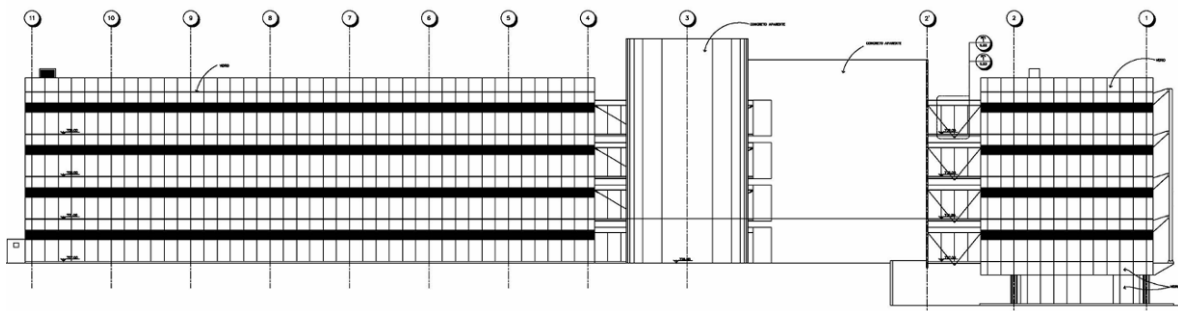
Elevation of North Façades, with Horizontal Brise-Soleil (black stripes) and Vertical-Brise Soleil (thin vertical lines)
